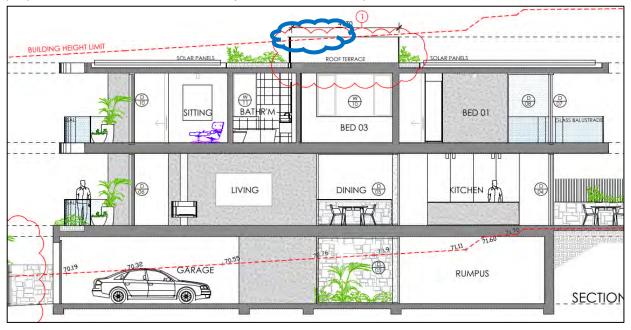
Proposed section plan, outlining location of the height breach (clouded blue).
